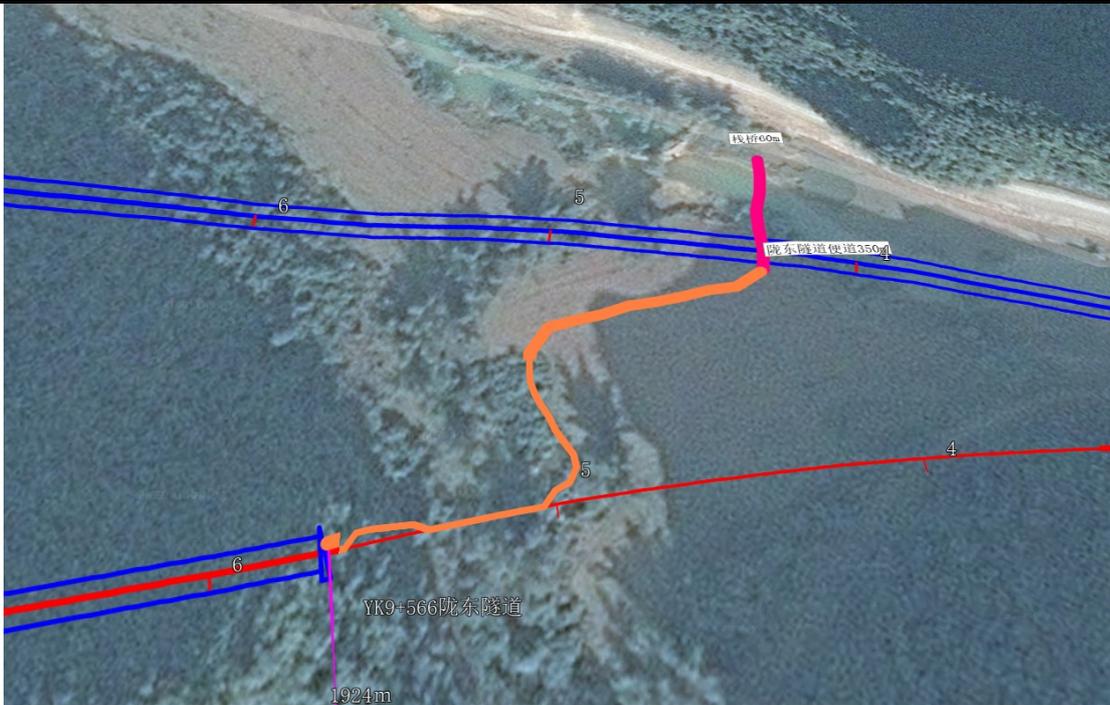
Location of New Access Road to Entrance of Longdong No.1 Tunnel
